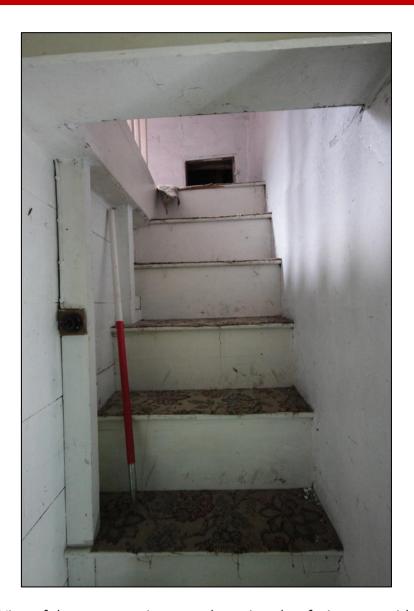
View of the narrow staircase to the attic, taken facing west with 1m scale.
